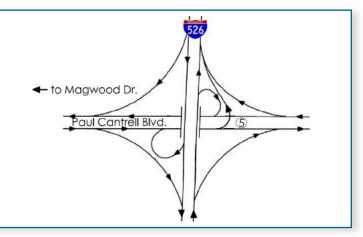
I-526 at Paul Cantrell Boulevard Alternative 1
